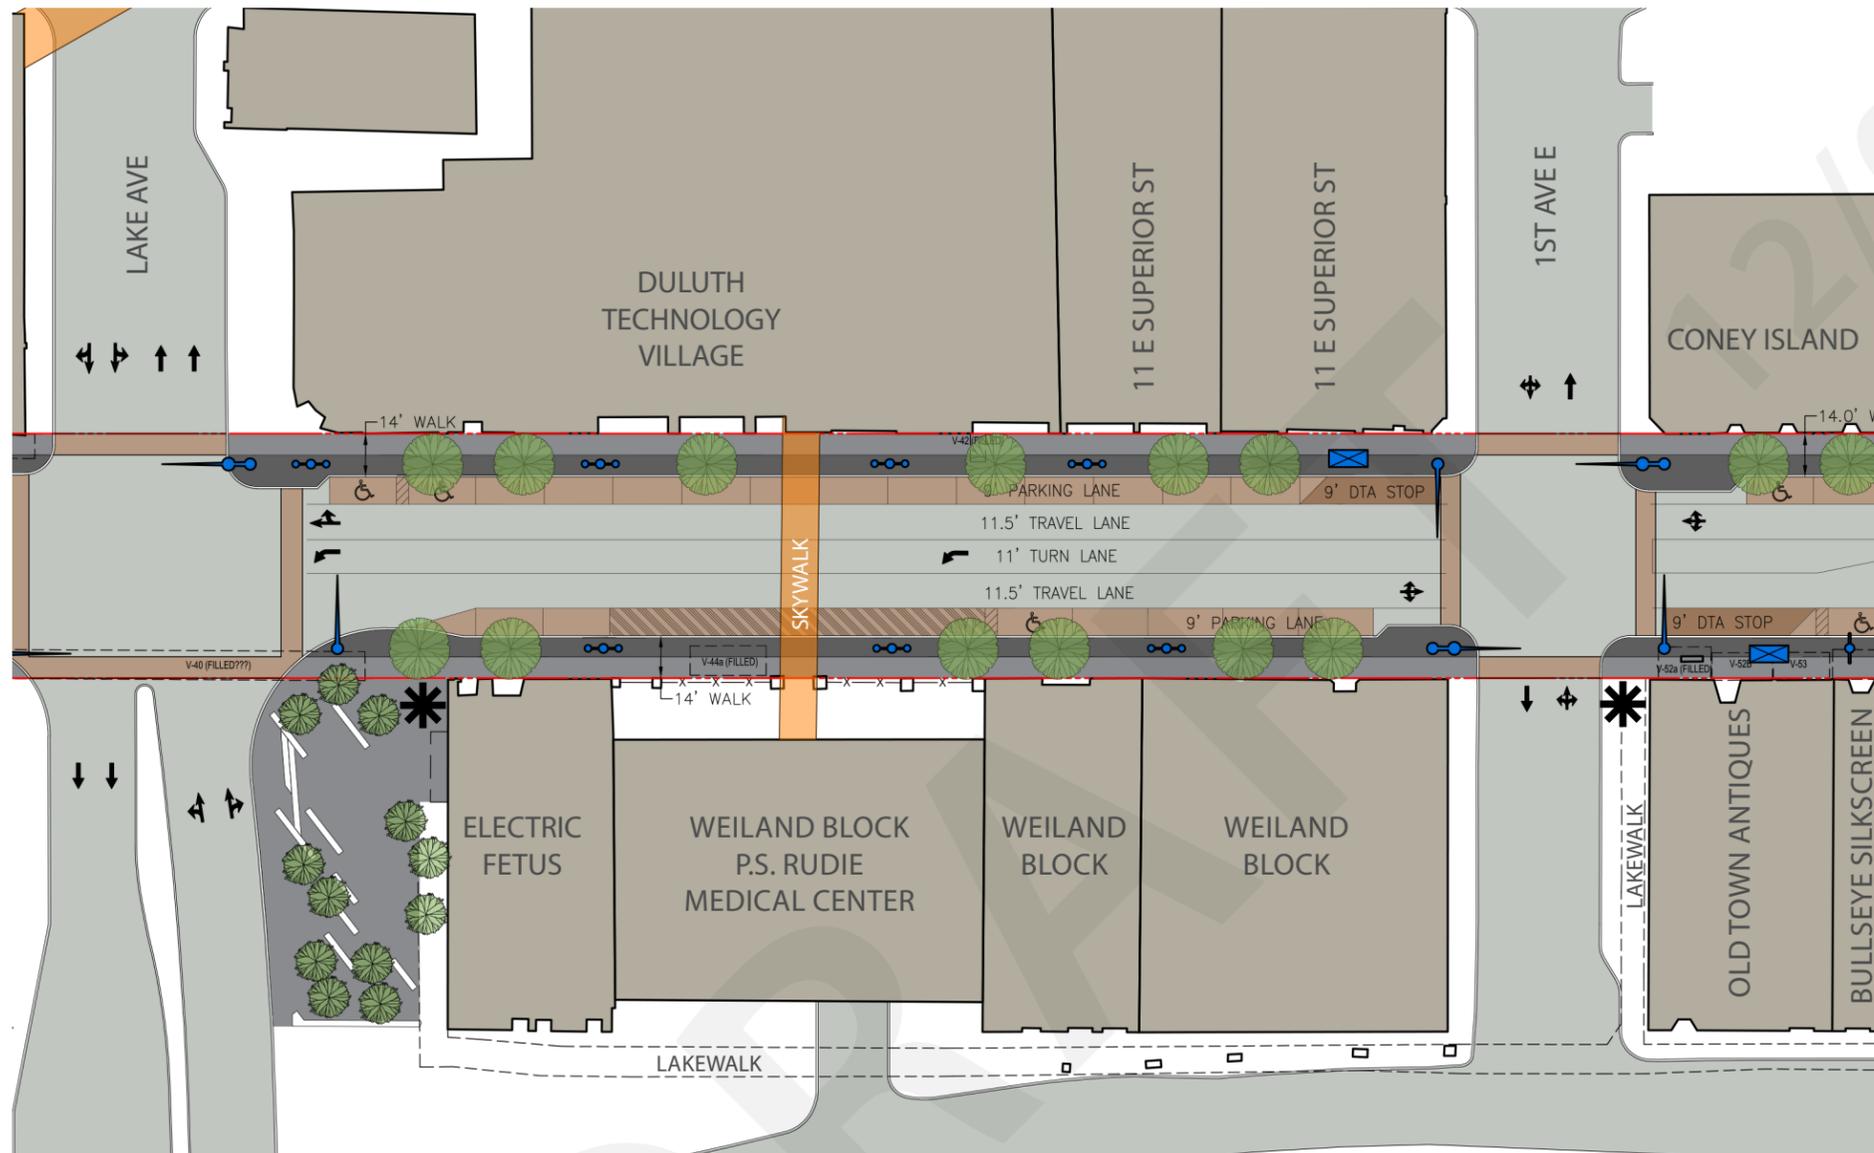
Streetscape layout between 1st Avenue West and Lake Avenue.
